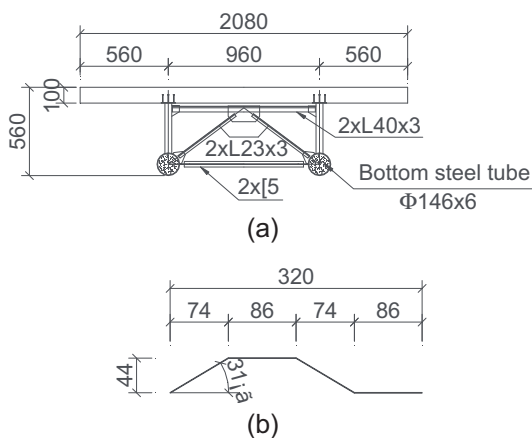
(a) Typical cross-section; and (b) a corrugation of the webs of test beam (Unit: mm).
